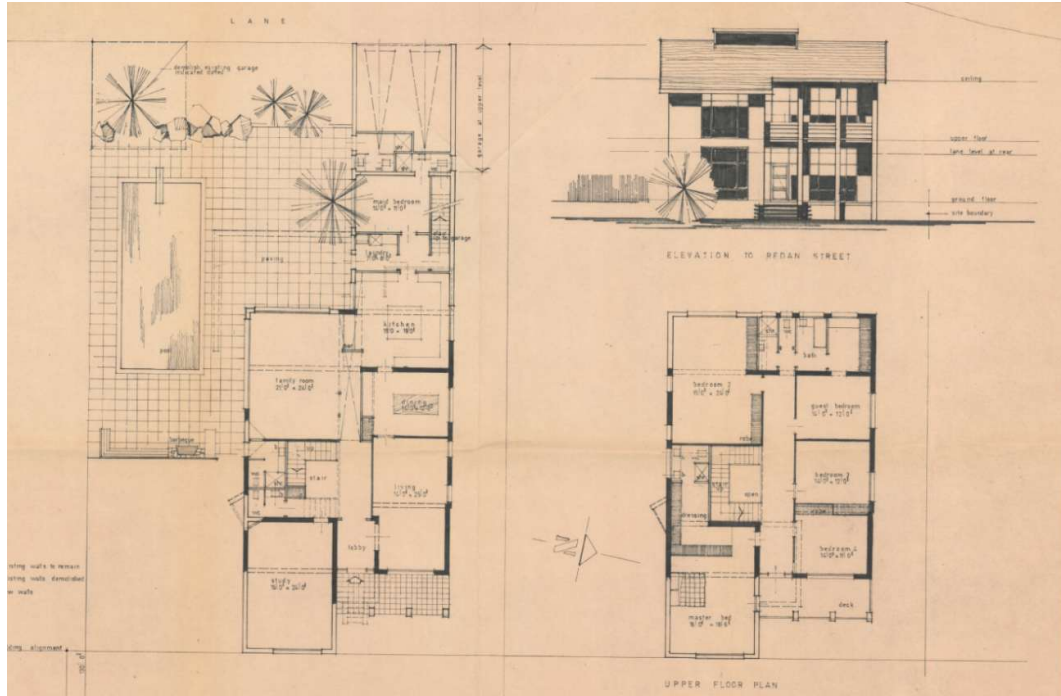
Archived Building Application 1971 showing proposed alterations and additions.
